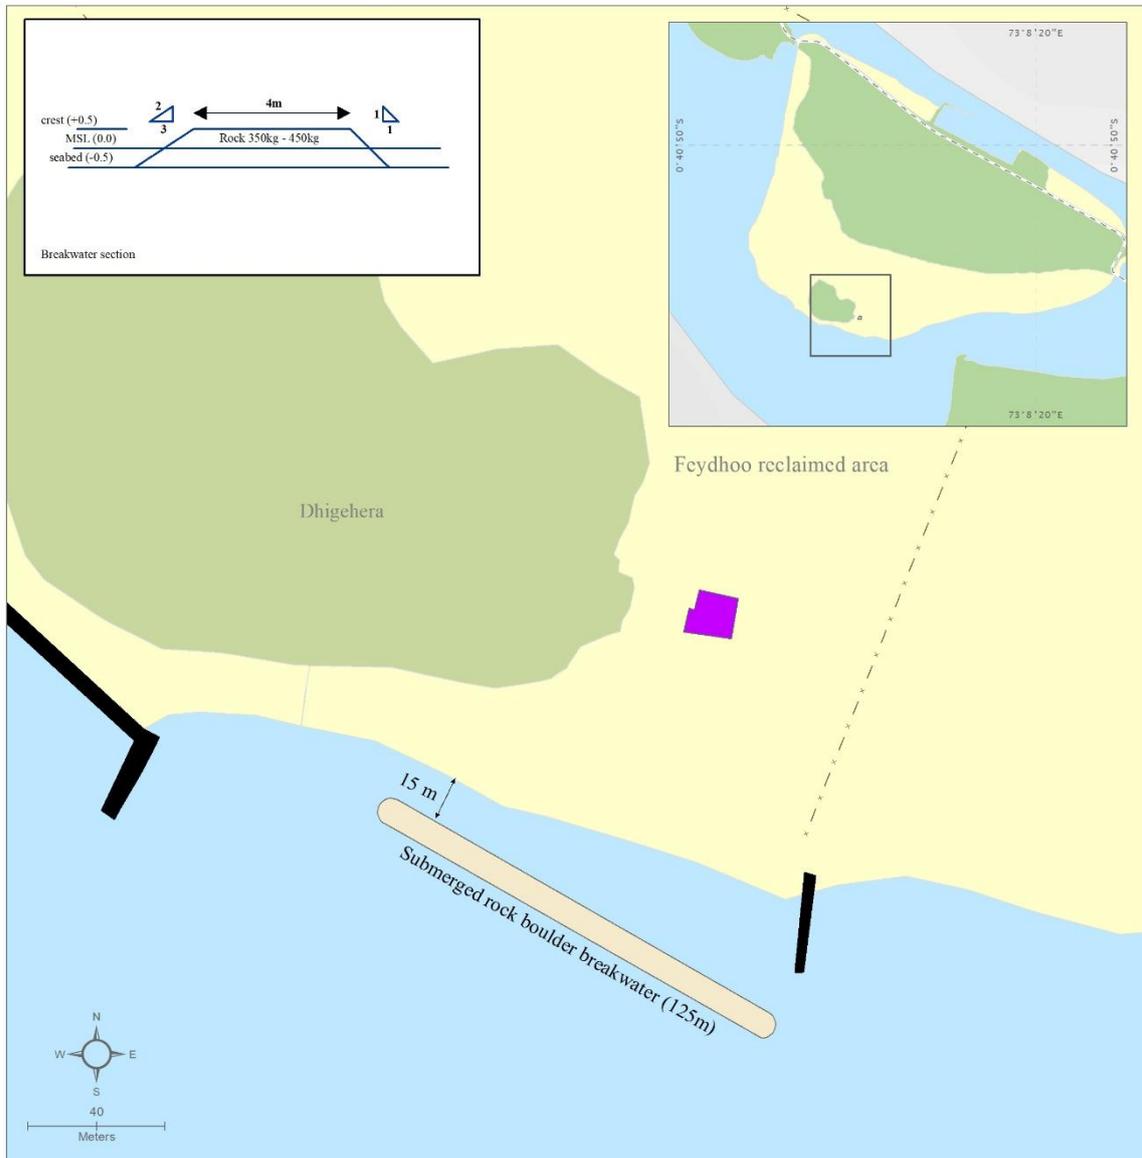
Coastal Protection Works Site Location and Proposed Concept
